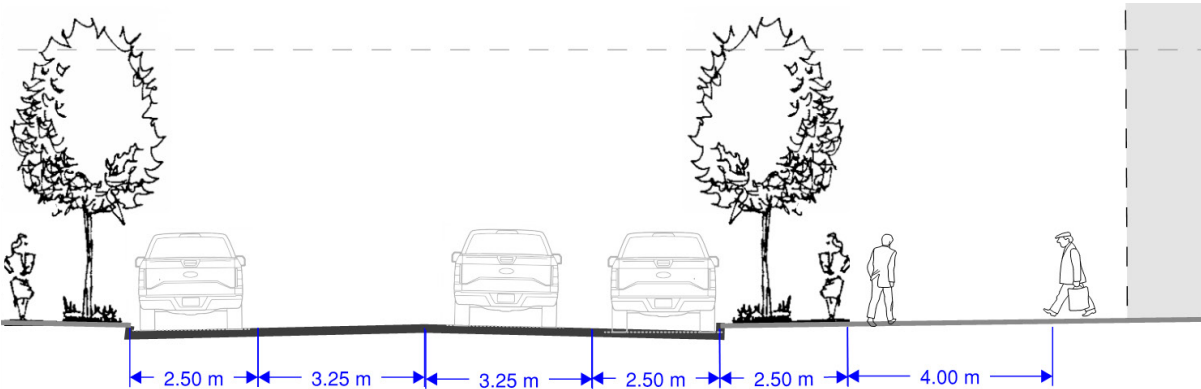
Cross-section for Lakelands Avenue, with Innisfil Beach Park on the left side.
